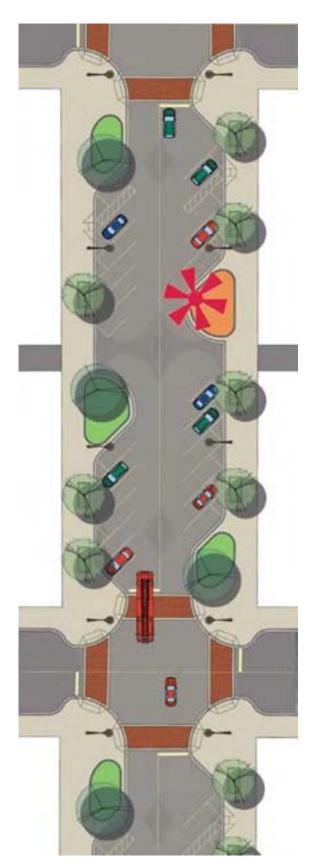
Argyle Streetscape Detail Plan / Perspective
